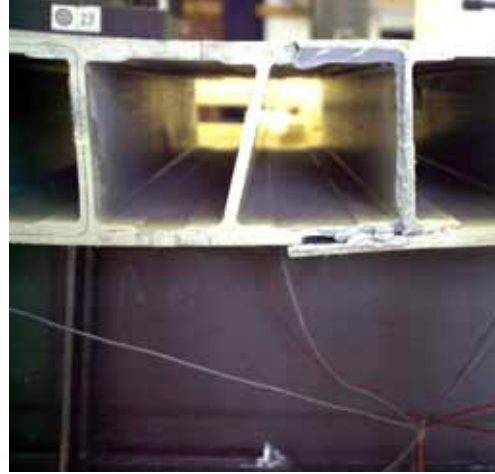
Initial failure of girder Fix 2 in epoxy joint of lower deck face panel between jacks.
